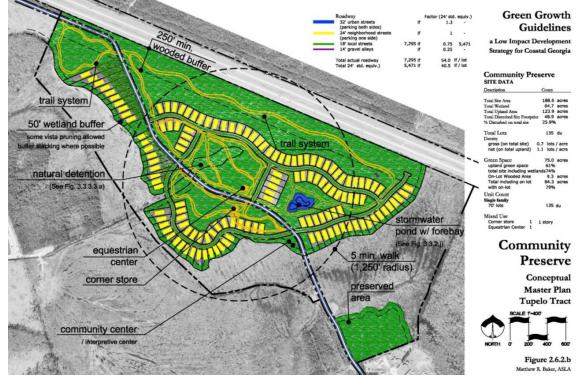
Conservation Site Design (source: Merrill et al., 2006).
